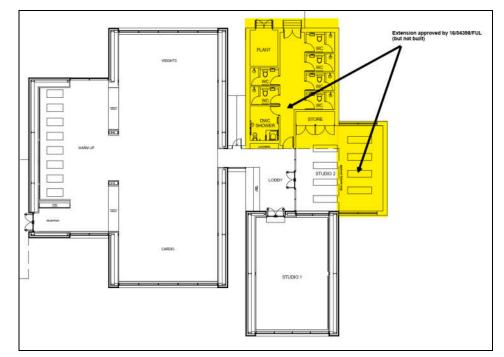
Gym Floor Plan Approved by 16/04368/FUL
